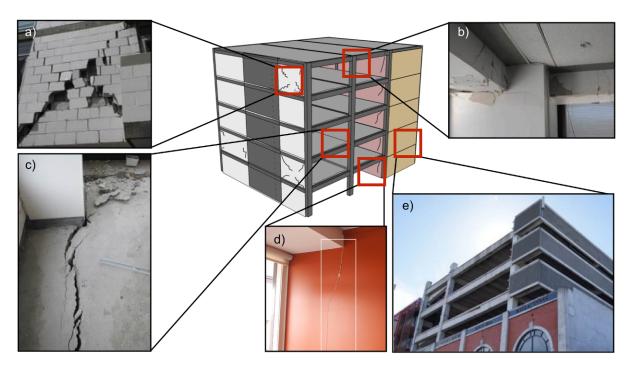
Typical damage to RC buildings from the Canterbury Earthquake sequence. a) Shear failure of infills, b) Beam end hinging, c) Floor cracking, d) Drywall infill cracking, e) Façade connection failure.
